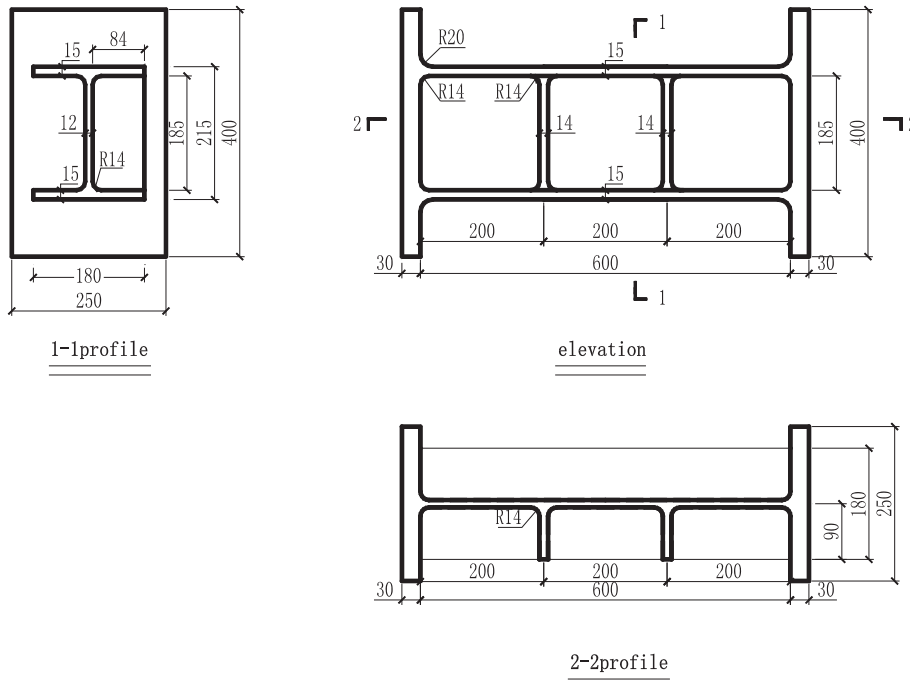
Dimensions of cast steel link beam specimens without perforation (unit: mm).
